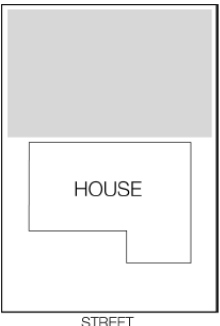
Diagram illustrating the exemptions applicable for new outbuildings on ‘Significant’ places on corner sites
